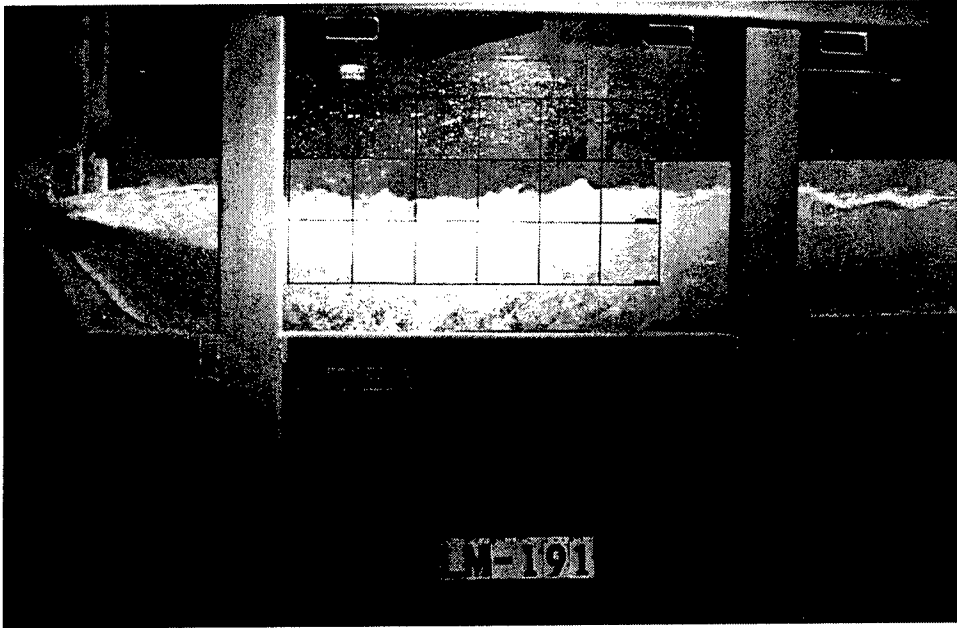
Type II deflector. Plunging jet. Gate opening – 6 ft, discharge – 10.2 kcfs/bay, pool elevation – 537, tailwater elevation – 442
